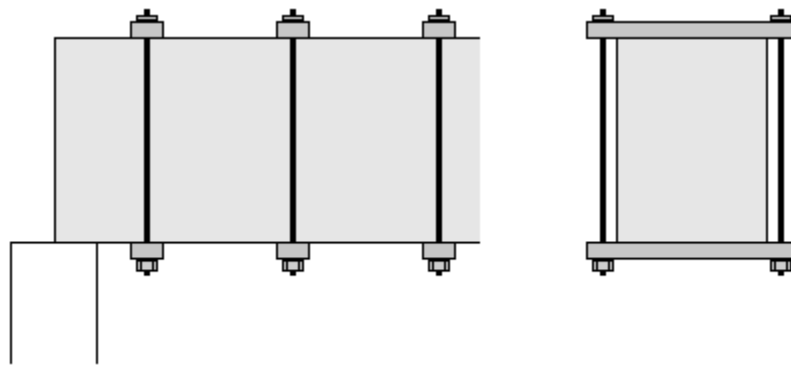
Shear strengthening of beams with vertical post-tensioned steel rods.
